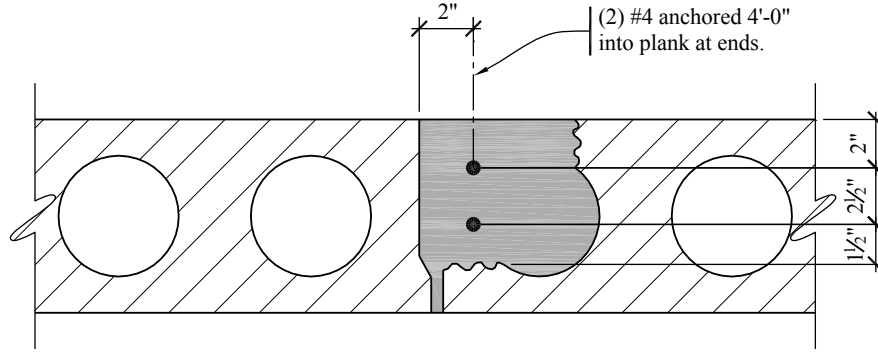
Anchorage region of shear reinforcement for Joint 1 and collector reinforcement for Joint 5
